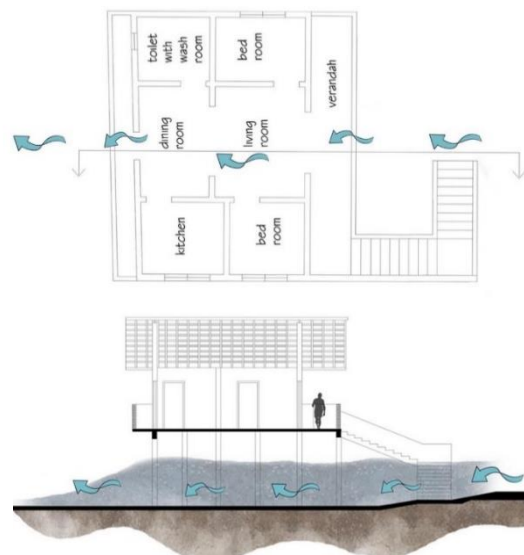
Floor Plan and Cross Section showing movement of flood water and level of inundation in Case 9 (Source: Henarangoda, 2020)
